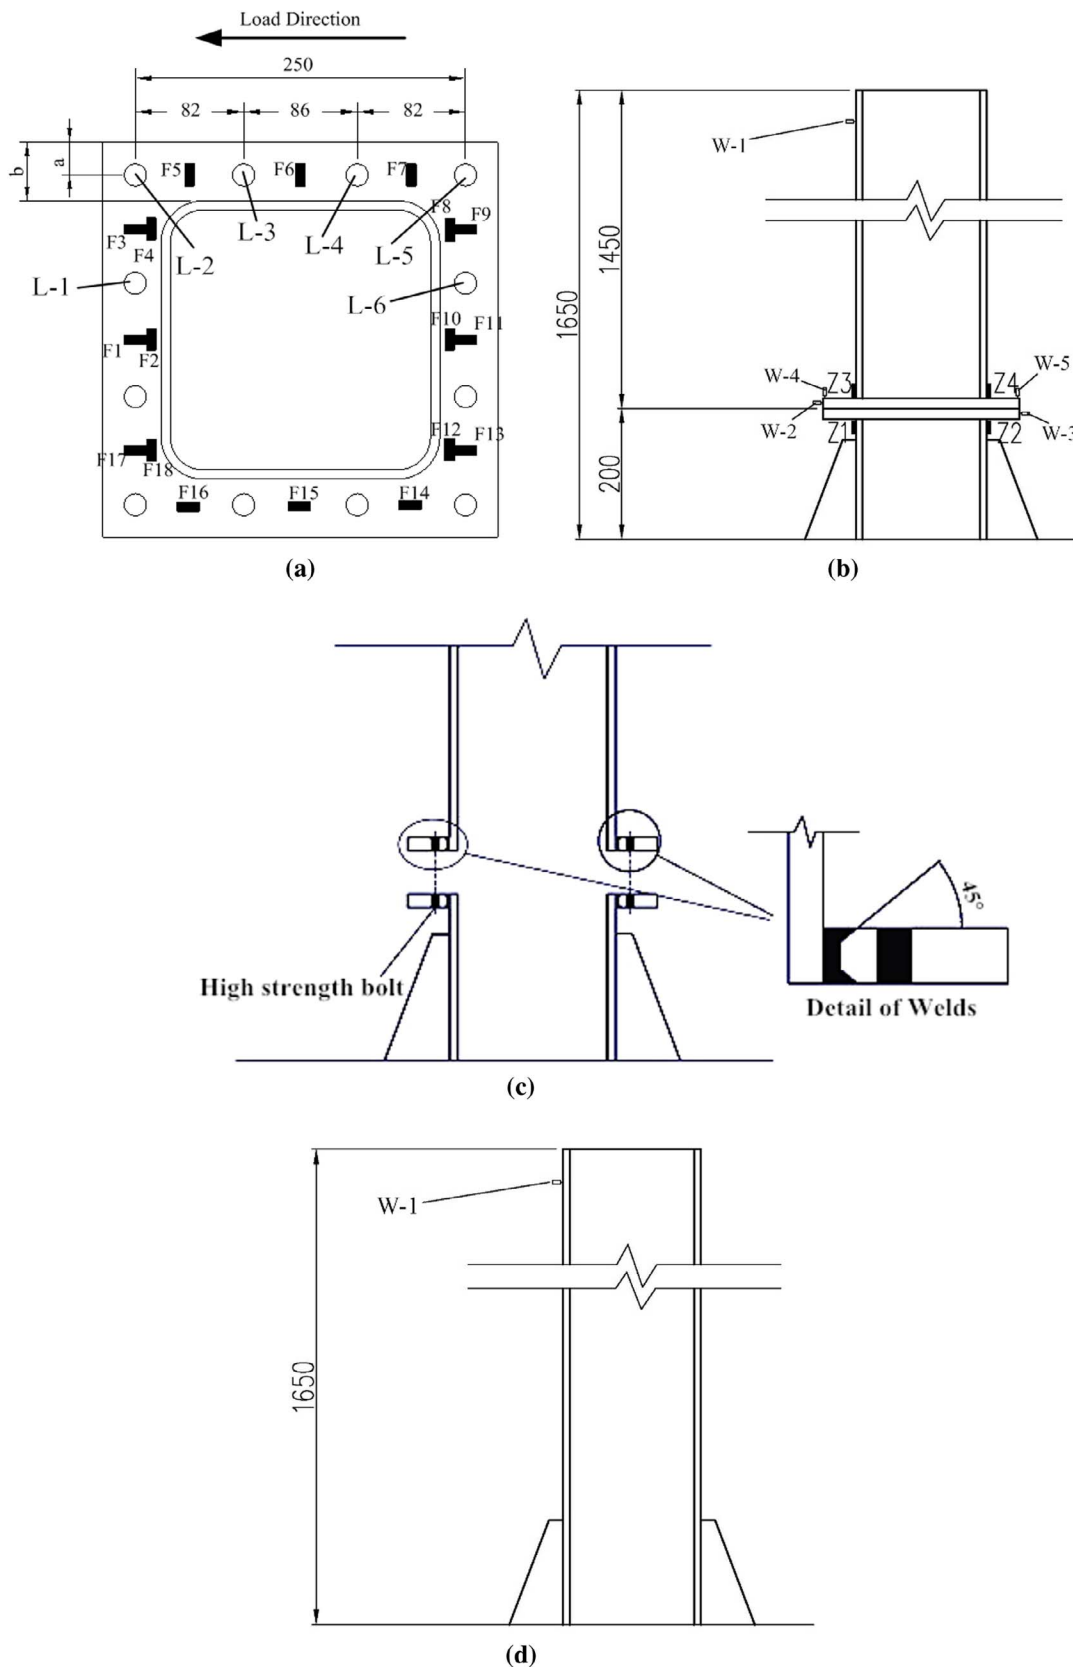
Test specimens. (a) Plan view of the flange. (b) Elevation view of a flange-connected column. (c) Assembly diagram of a flange-connected column. (d) Elevation view of a column with no connections.
